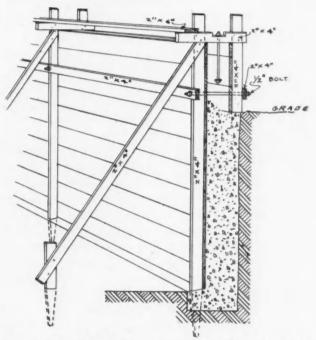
Cheap Type of Concrete Foundation Wall for Use with Light Building
